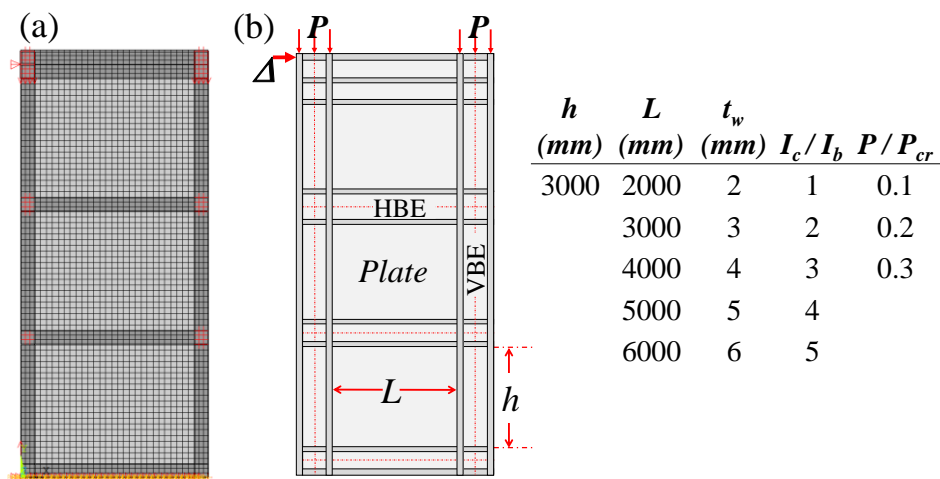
(a) A representative finite element model of SPSWs used in the study; (b) Typical steel plate shear wall configuration.
